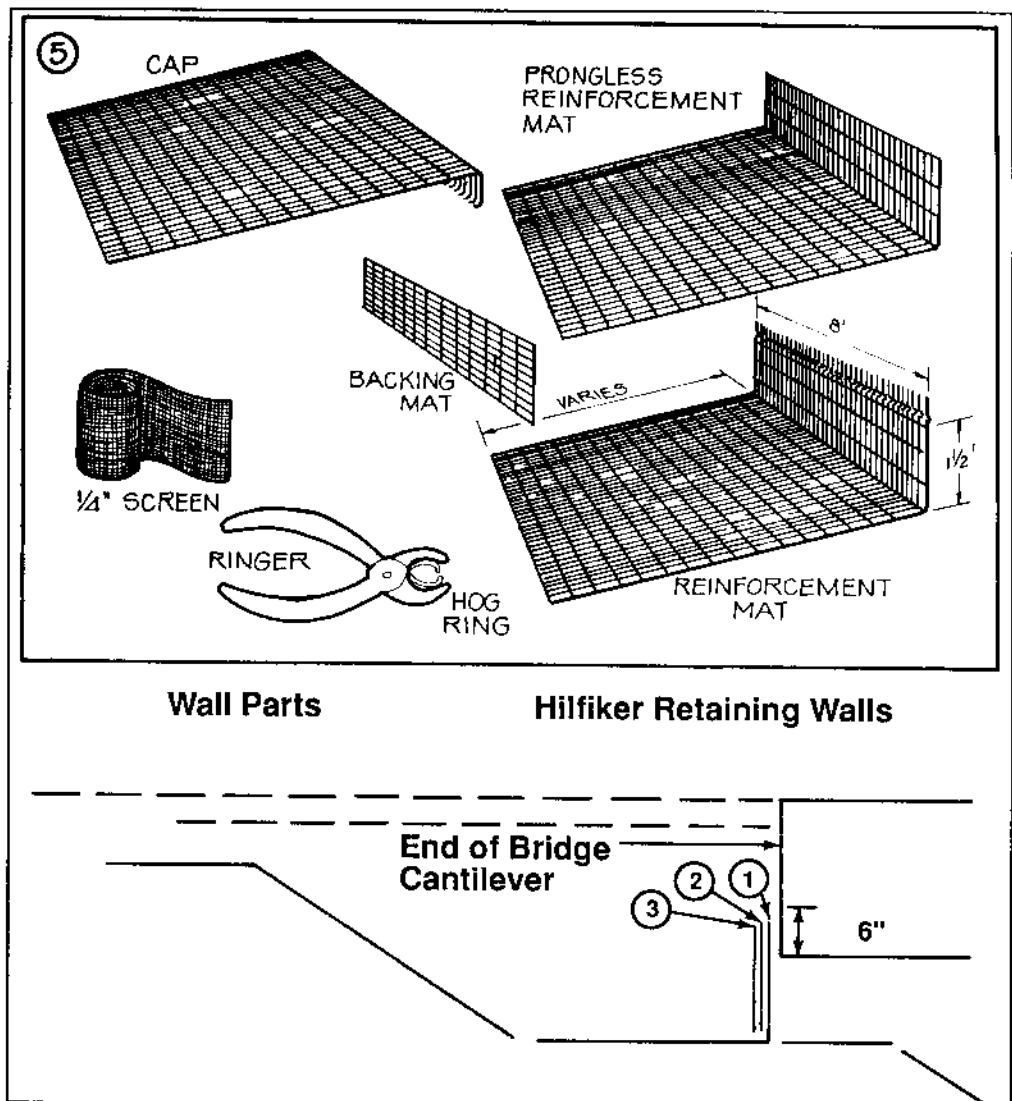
Sketch of wall parts and Hilfiker retaining walls.
